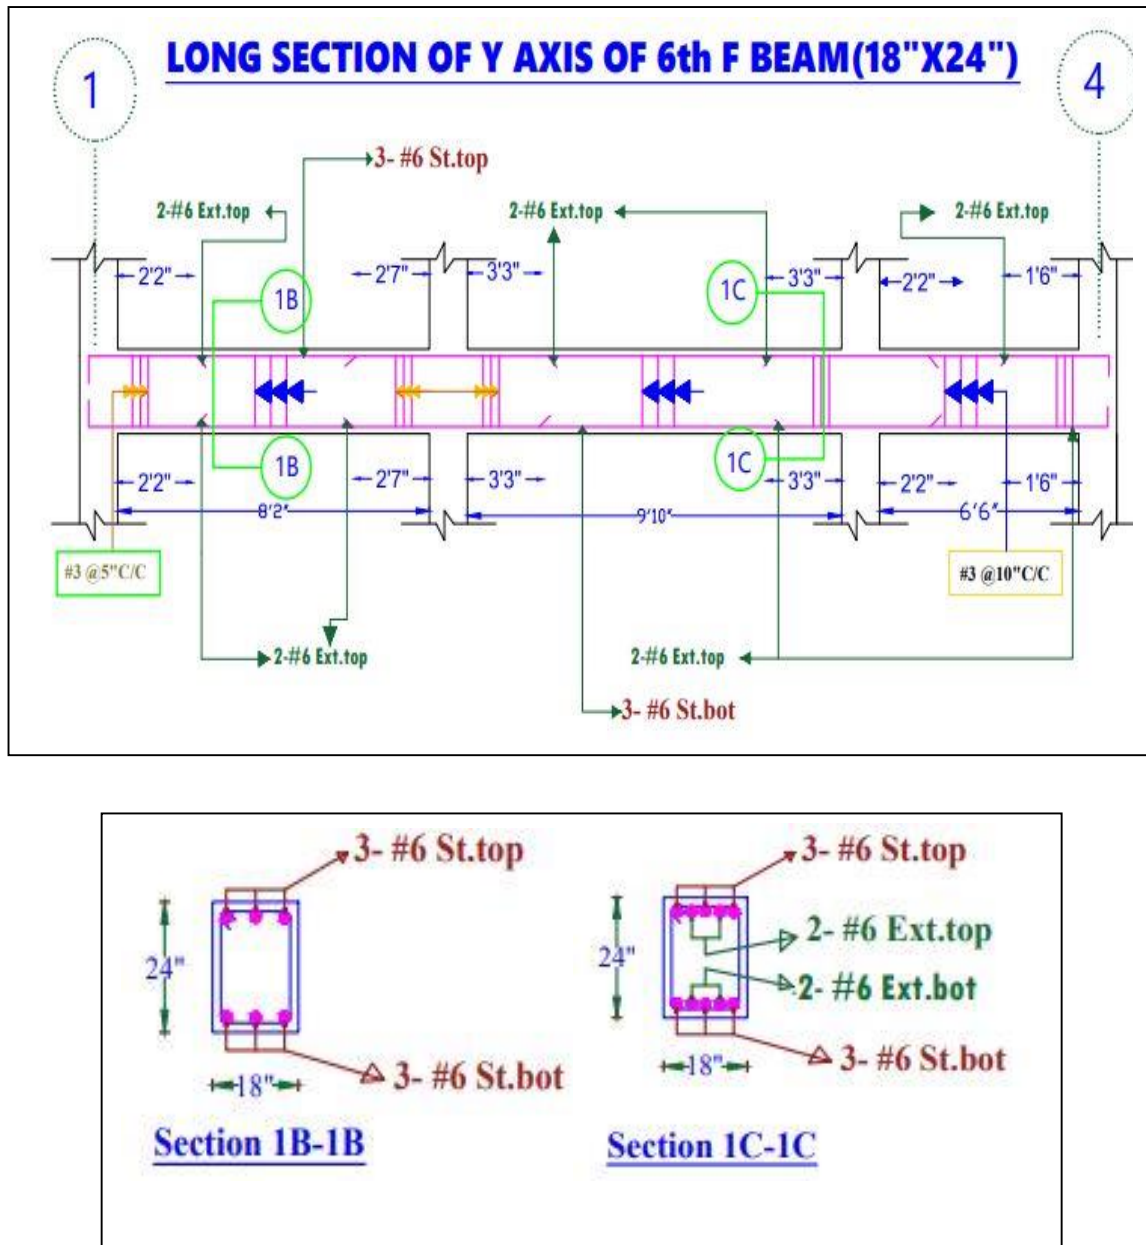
Beam Detailing & Cross Section of Y-axis
